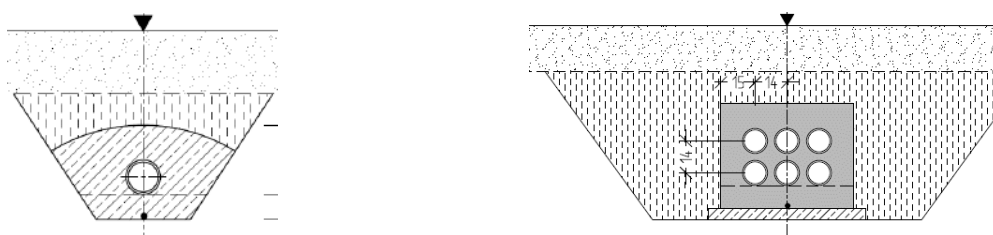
Typical Cross-Sections of Conduit Cable Ducts
